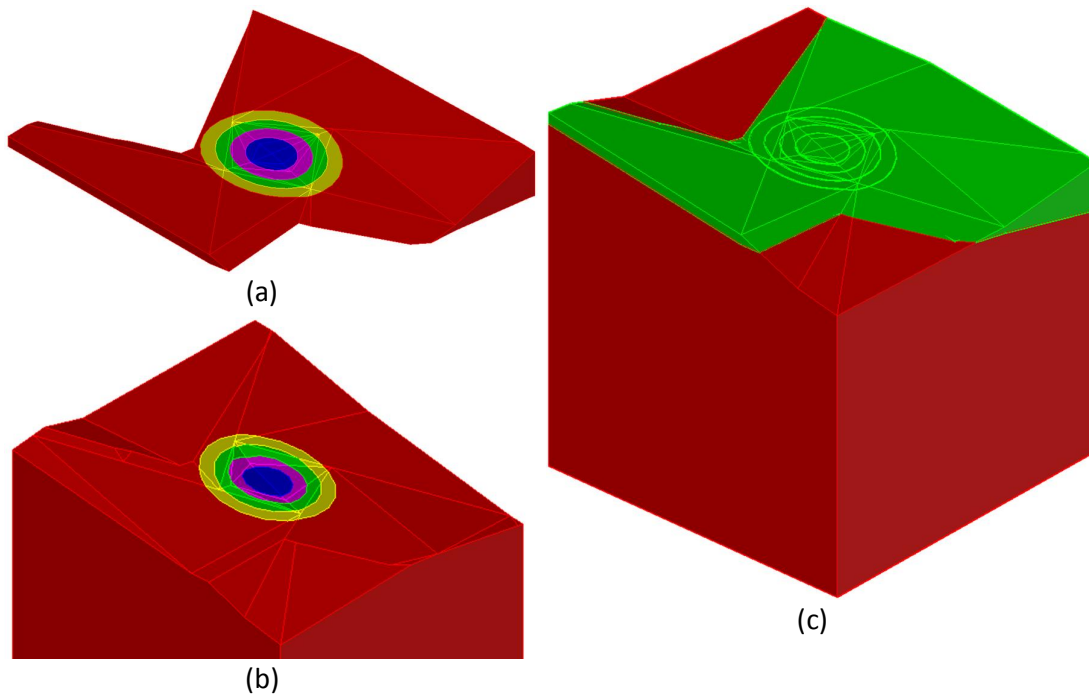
3D-Models from AutoCAD according to the technical drawings of Figure 27, Figure 28, and Figure 29, with (a) soil layer, (b) bedrock and (c) assembly of soil and bedrock. Blue is inner cylinder of radius 7 m, magenta is 7 m until 11 m, green is 11 m until 15 m, yellow is 15 m until 19 m, and red is 19 m until border
